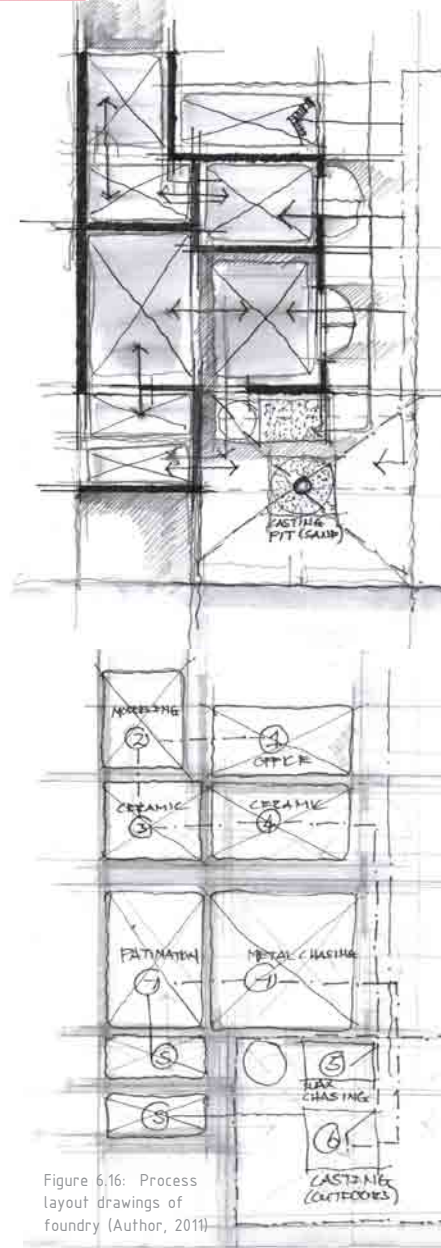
Process layout drawings of foundry (Author, 2011)
